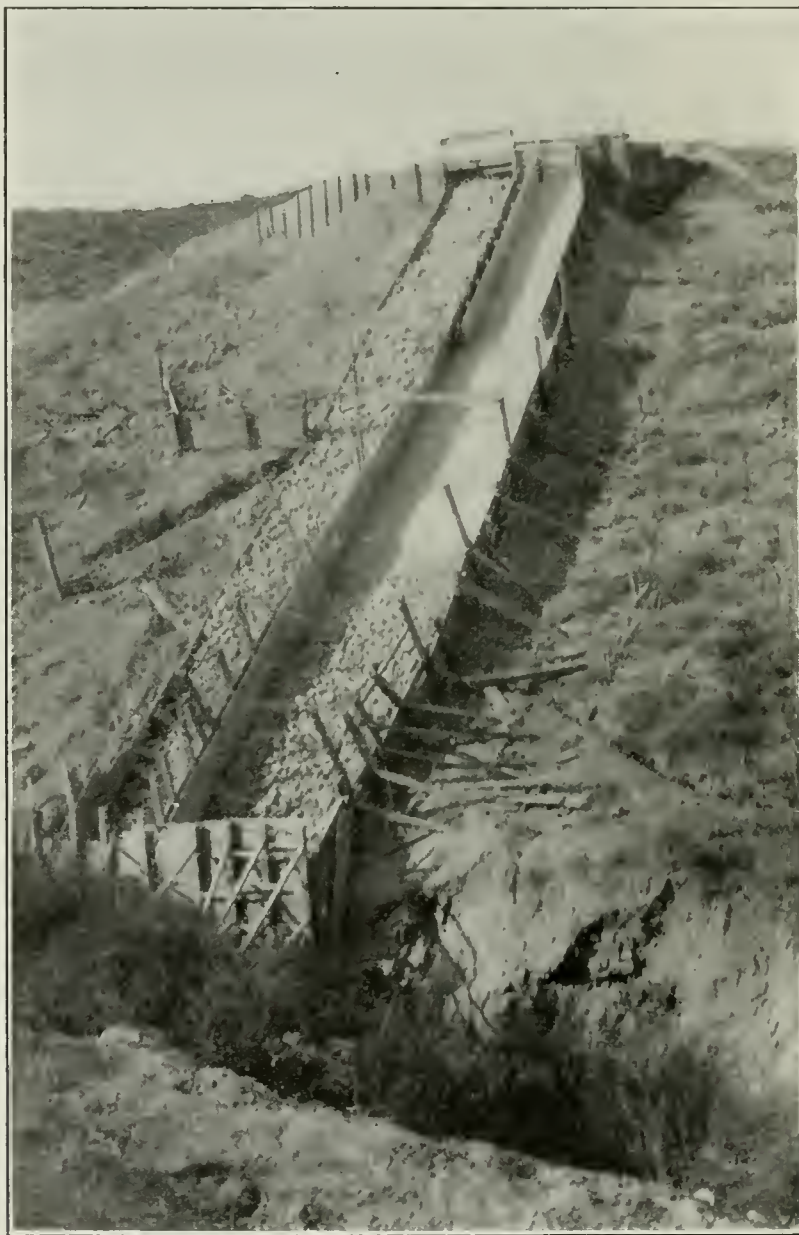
Loading chute, Emsco Clay Co. (Harrington pit), Riverside County.
